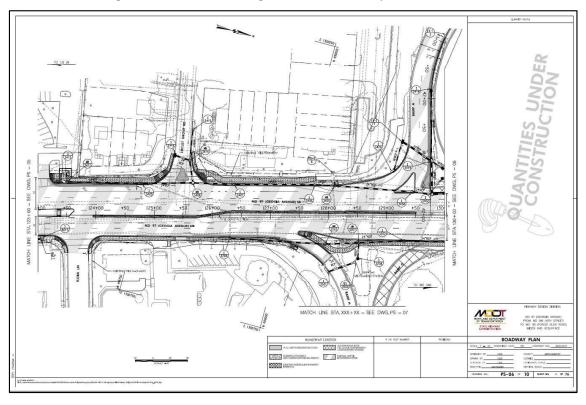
Plan View – Georgia Avenue between Flora Lane and I-495 Inner Loop Signal
